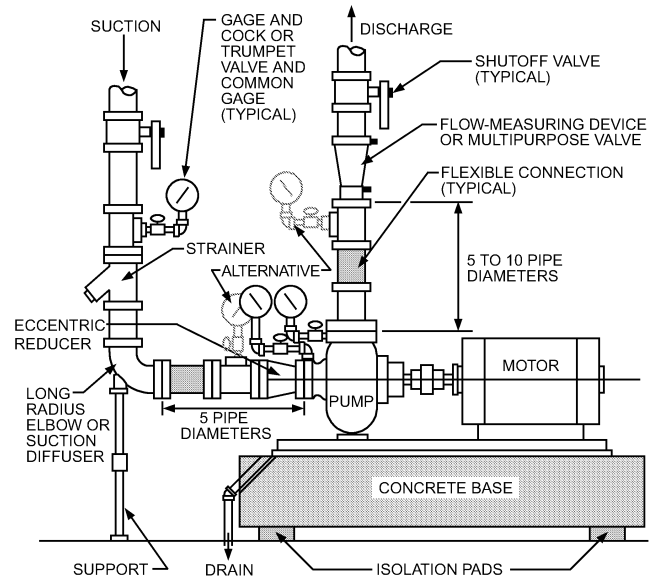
Base Plate-Mounted Centrifugal Pump Installation
